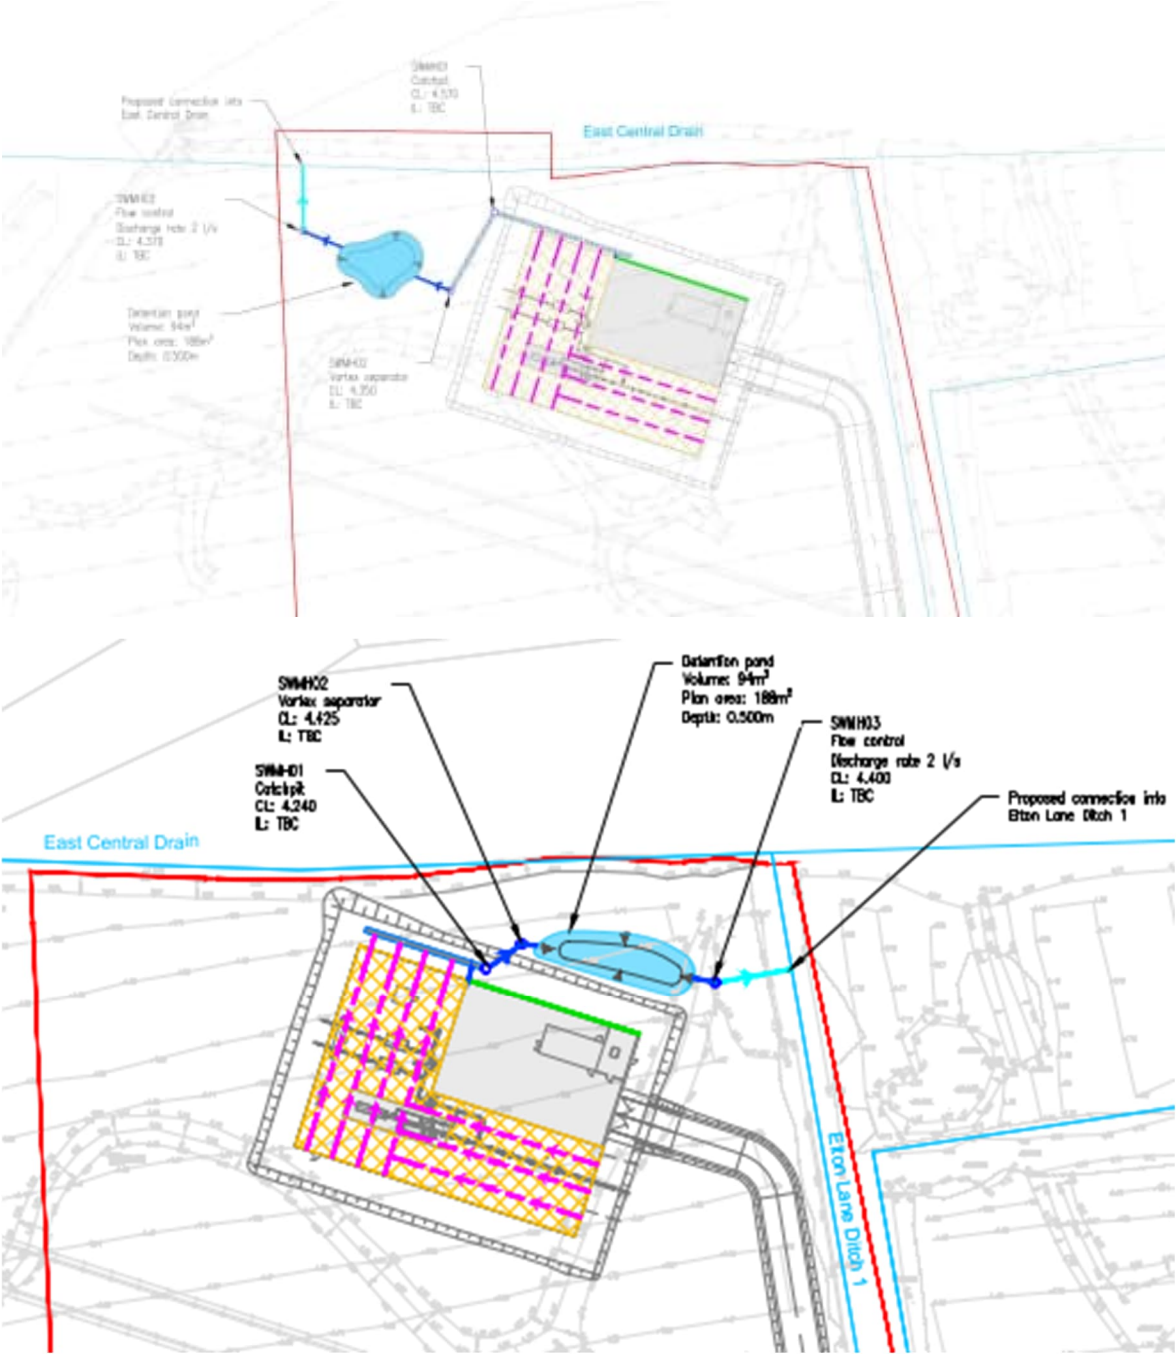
Before and after the reduced Newbuild Infrastructure Boundary at Picton Lane – Land Plan
